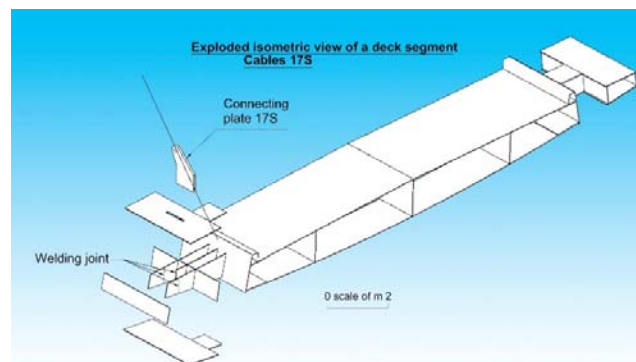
Exploded view showing the anchorage of the cables in the deck © EGIS
